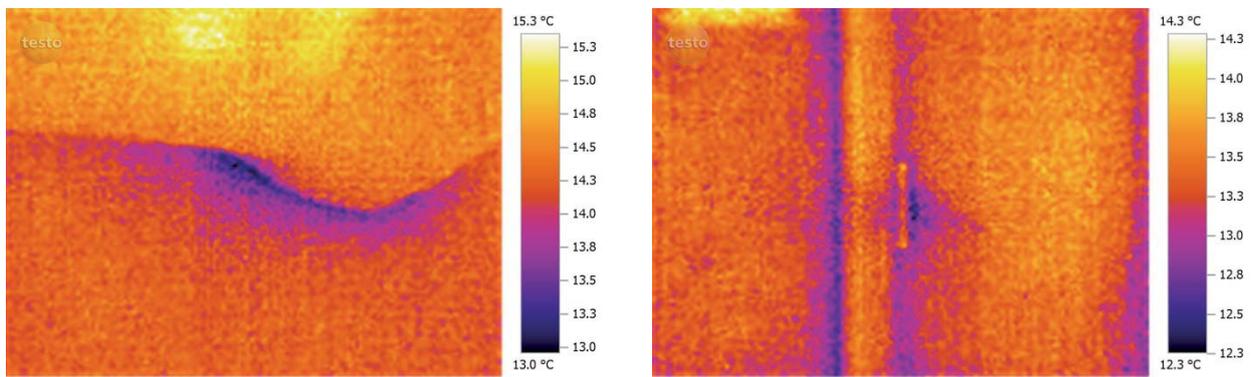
Internal thermal images: a crack around a ventilation duct (left) and missing insulation on the door hinge (right)
